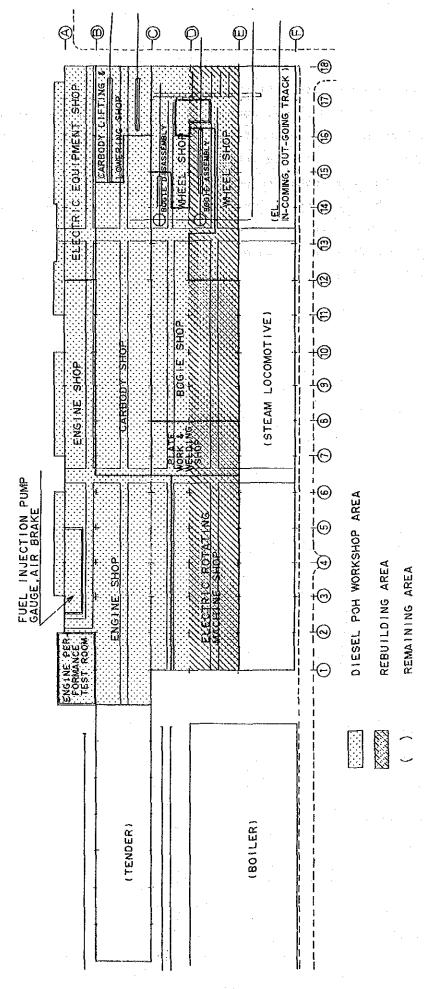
Workshop Layout Plan (Plan 1)
